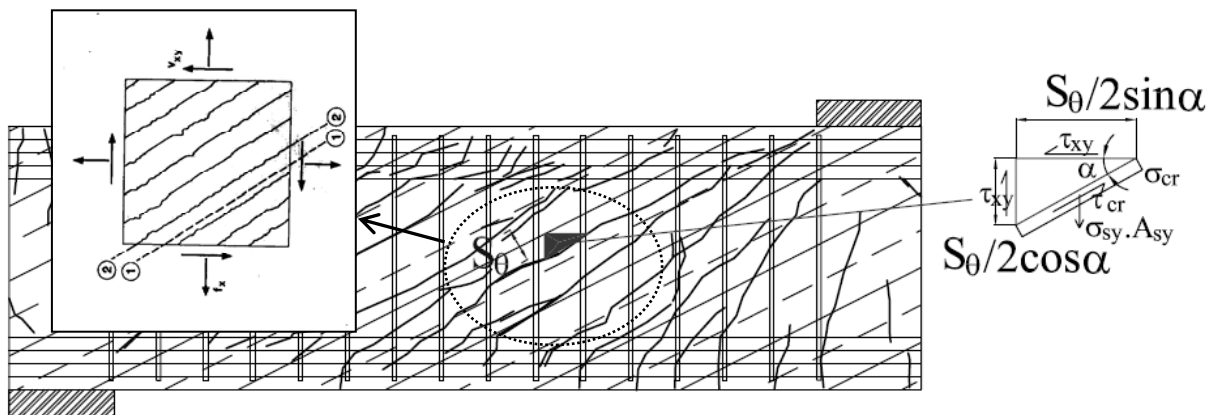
Differential element used in the crack-slip model for continuous beams
